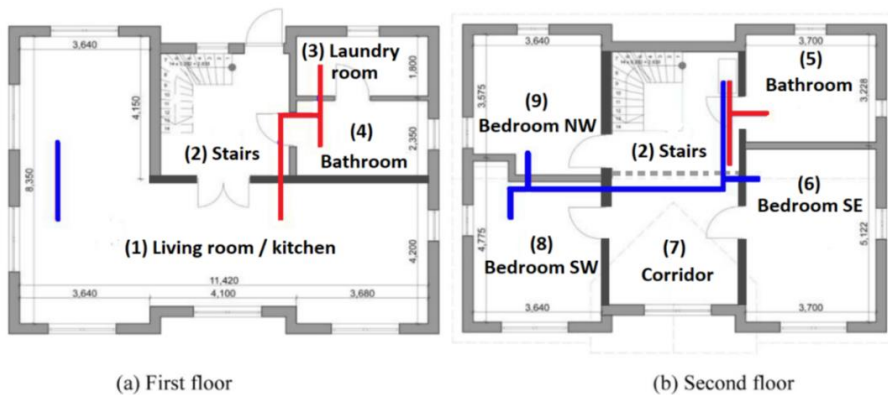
Floor plan of the test building (ducts for the supply air are in blue and in red for extraction).
